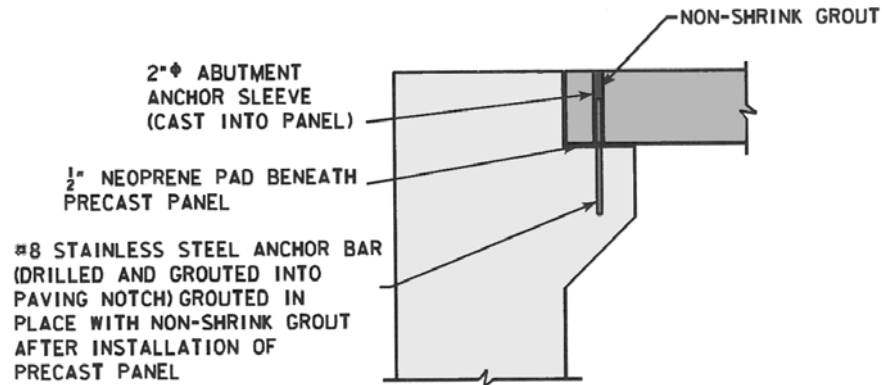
Illustration. Abutment anchor detail for PPCP approach slabs.
